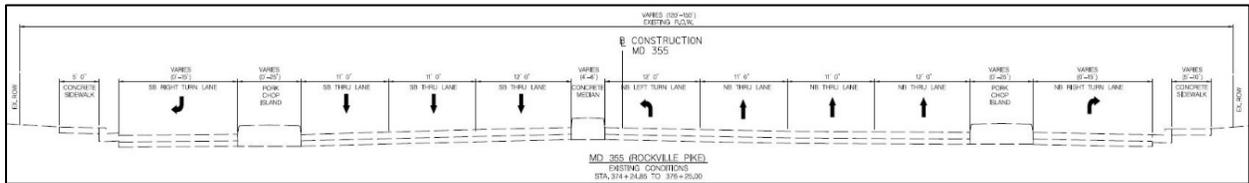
Existing Typical Cross Section – Rockville Pike at Old Georgetown Road Approach
